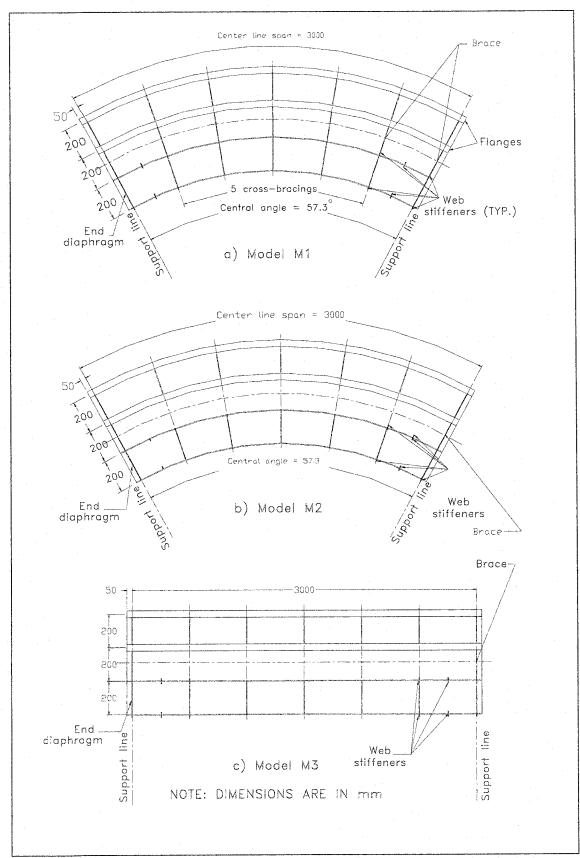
Plan view of without the concrete deck slab (see section a-a in Fig.3.1)
